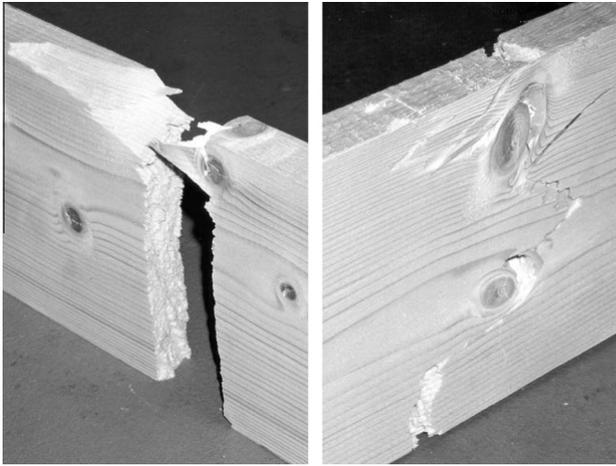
Failure in boards at tensile loading initiated by knots [8].
